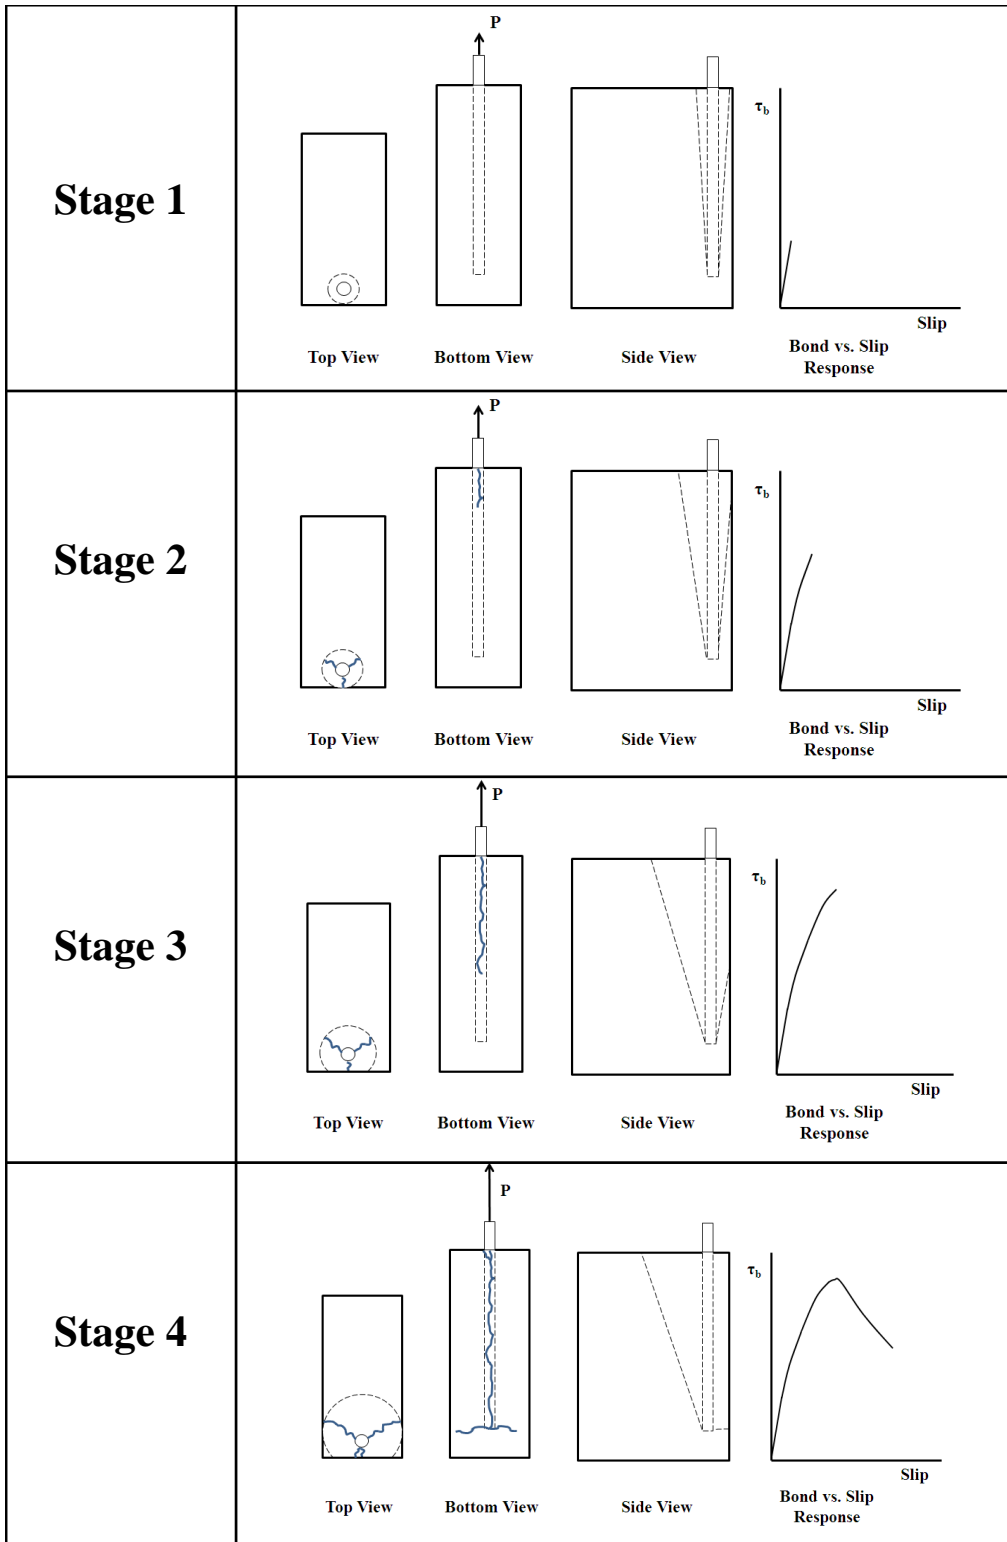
Typical observed stress fields and cracking of beam-end specimens
